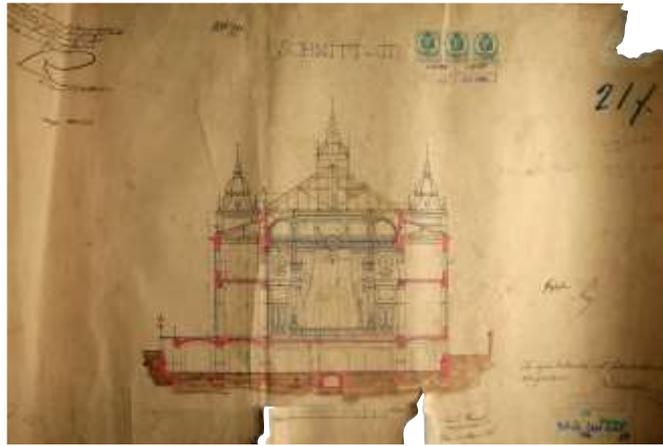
Short Section - original plan 1895 - source: National State Archives
